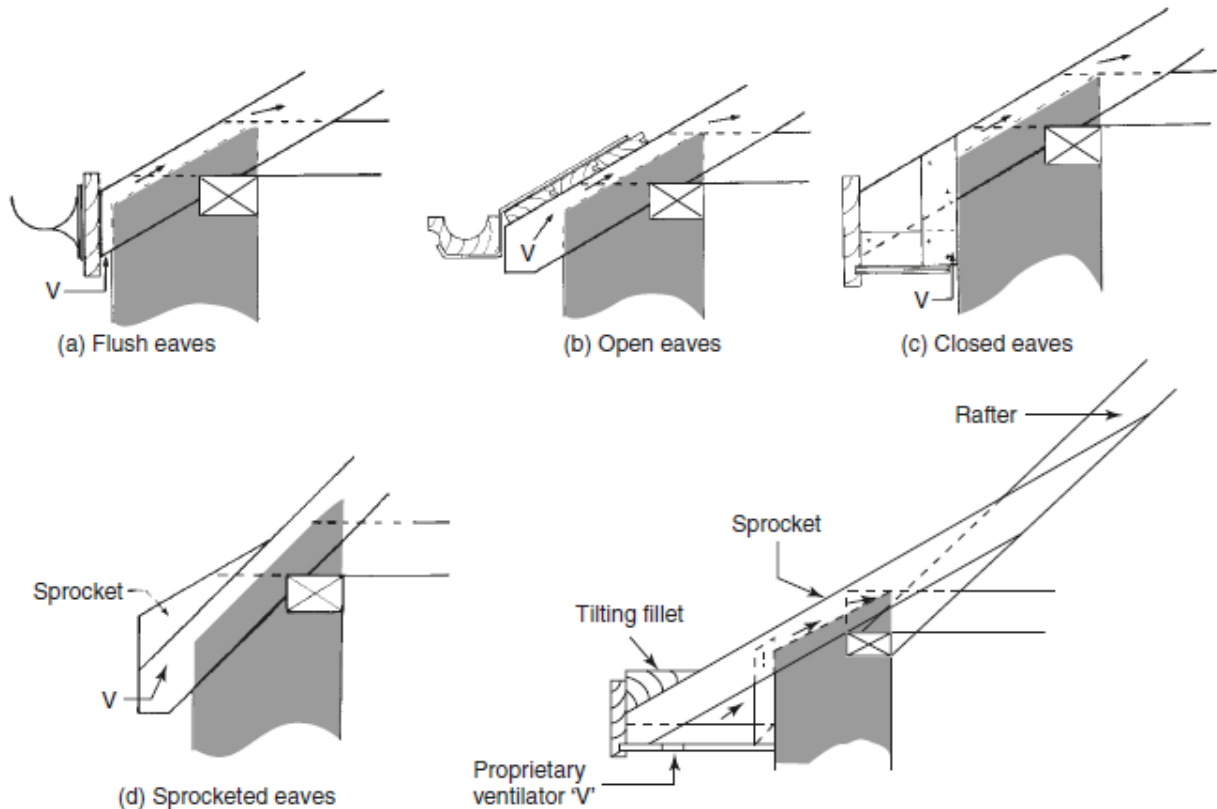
Eaves details, V = ventilation to roof space, mesh covered to deter insects and birds, etc.
